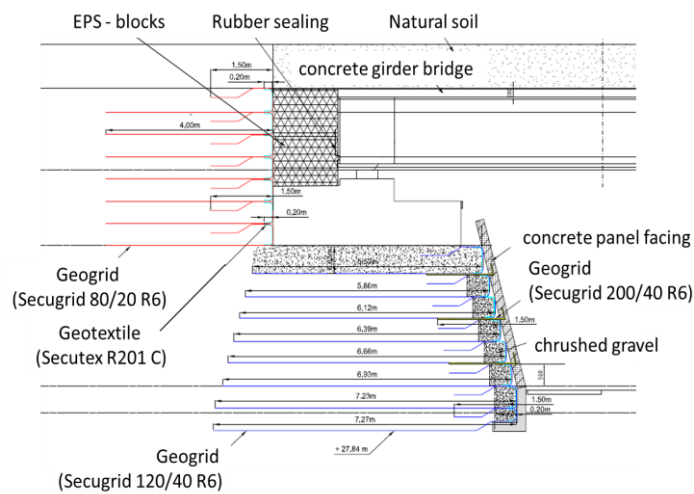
Cross section of the geogrid-reinforced bridge abutment
